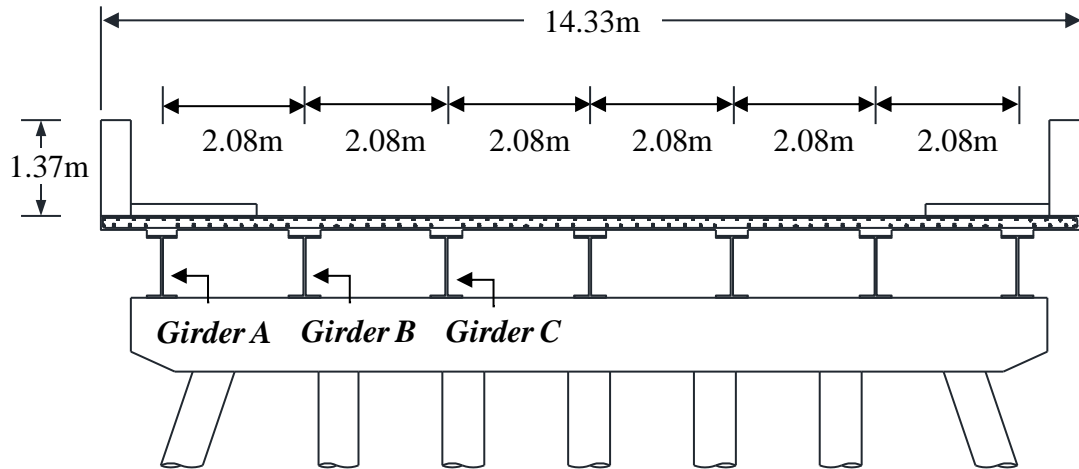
Composite girder section of S-17 Bridge. All dimensions are in cm.
